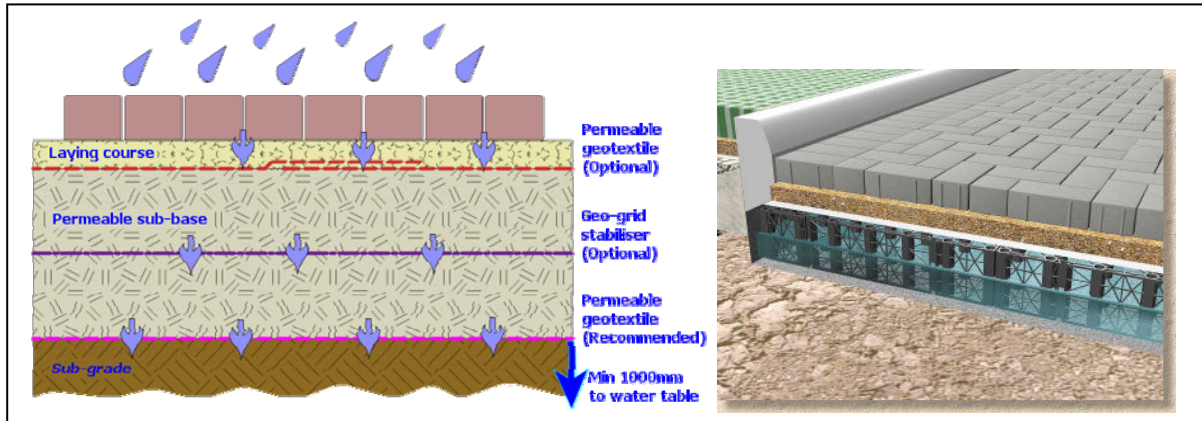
System A - Total Infiltration Permeable Pavement (Mccormack, 2009)
